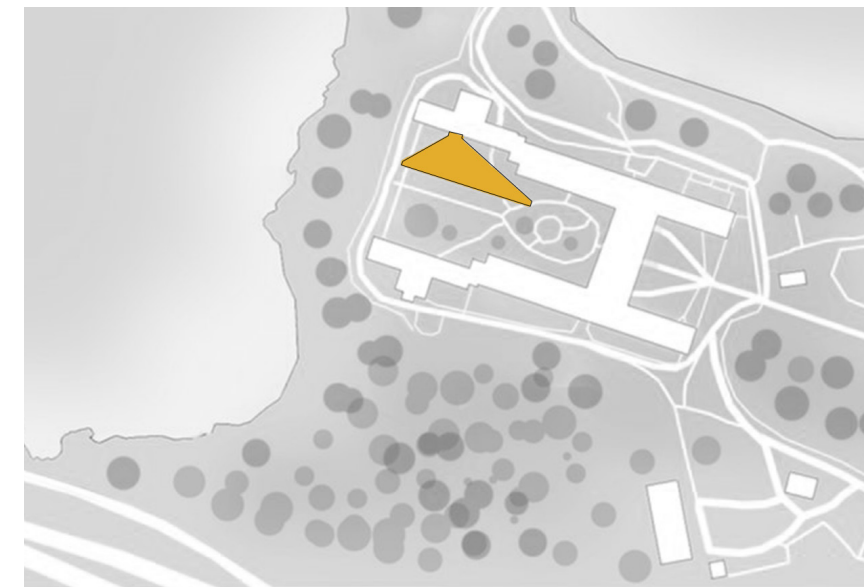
Site plan of Lapinlahti Psychiatric Hospital HELSINKI, altered by authors.
